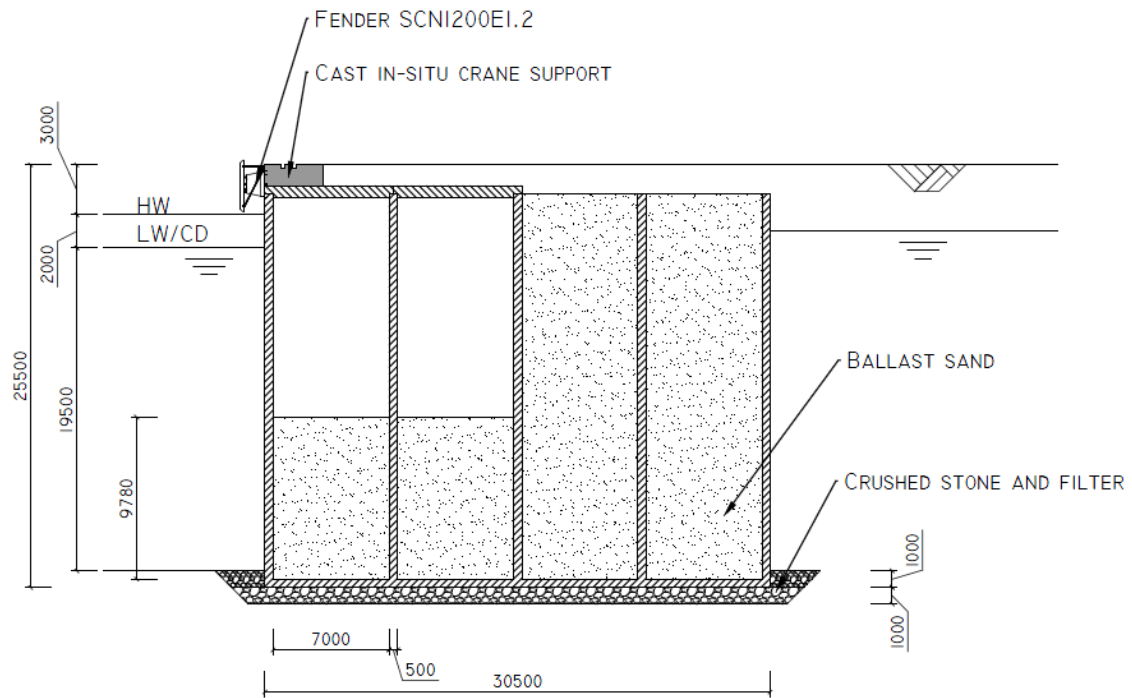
Design of caisson  $CD_{19.5}$  dimensions: mm
